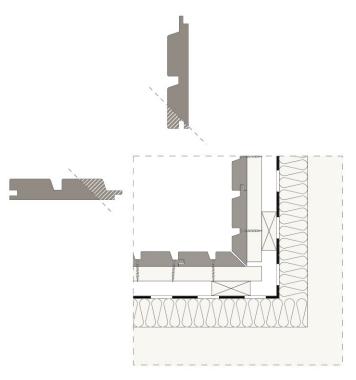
Internal corner finishing by cutting the board edges at a 45° angle
